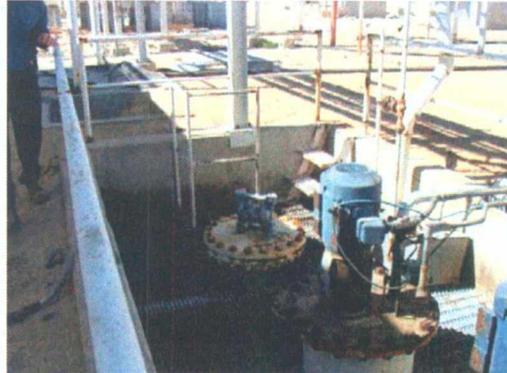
Large below grade tank located within the gas plant boundaries, east of the compressor station.
